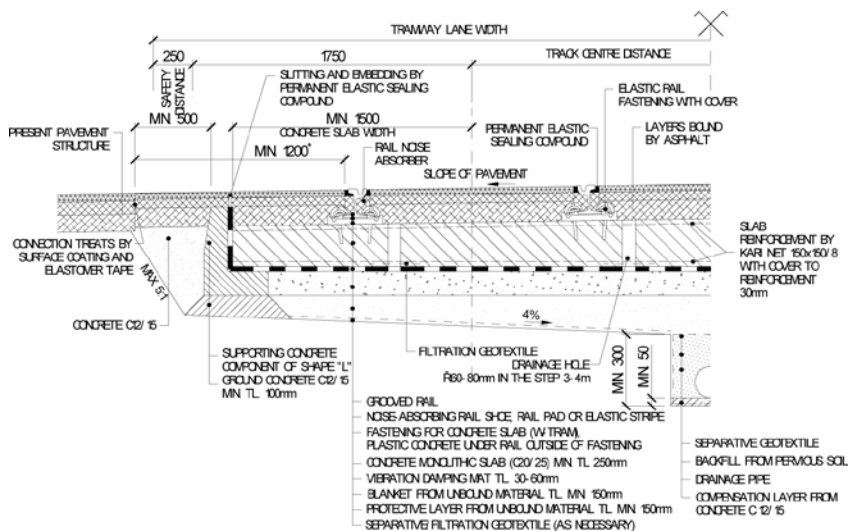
The design of tram track with monolithic concrete slab with absorbing mat
